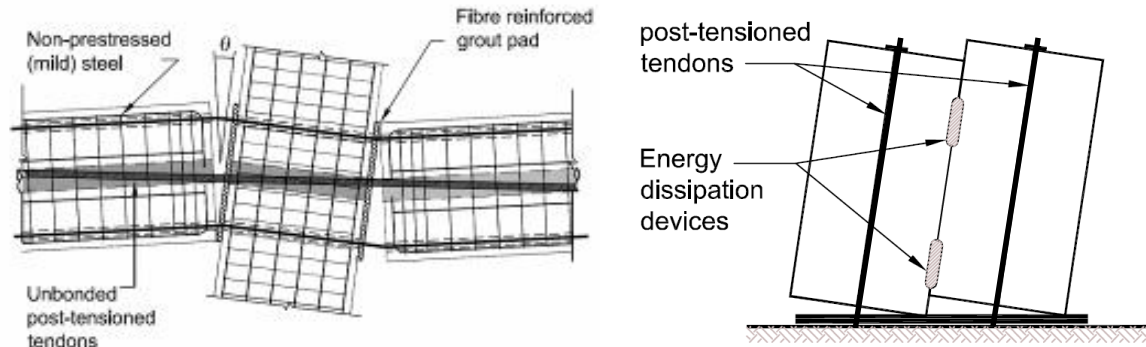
Jointed precast hybrid frame and wall systems developed in the PRESS-Program [2]
